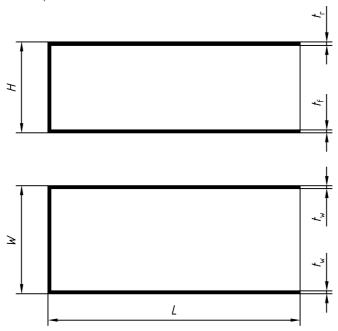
Garage box without a door frame (dimensions according to Table E.2)
